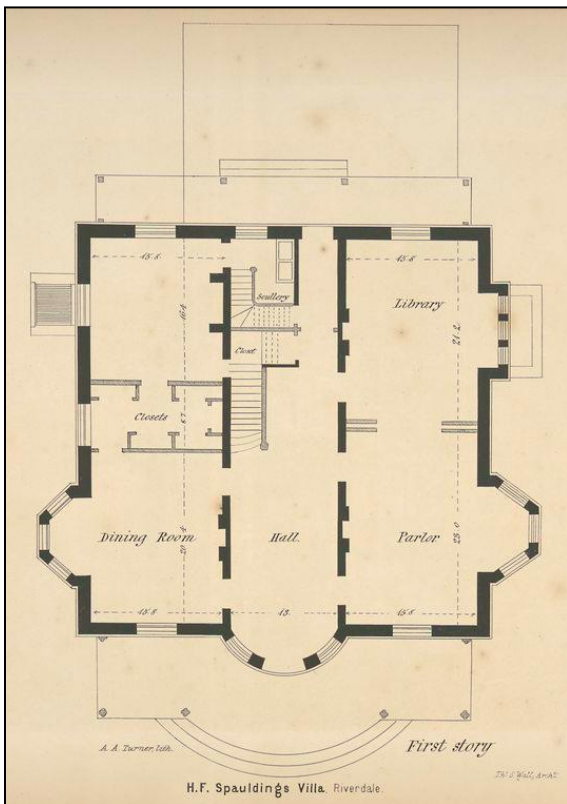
Floor plan of Henry F. Spaulding House with Thomas S. Wall identified as architect. From A.A.Turner, *Villas on the Hudson* (1860).
